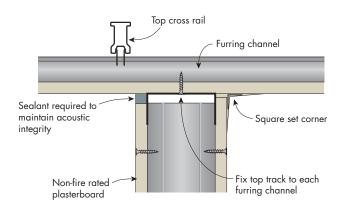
Wall Head to Suspended Ceiling Finishing Detail
